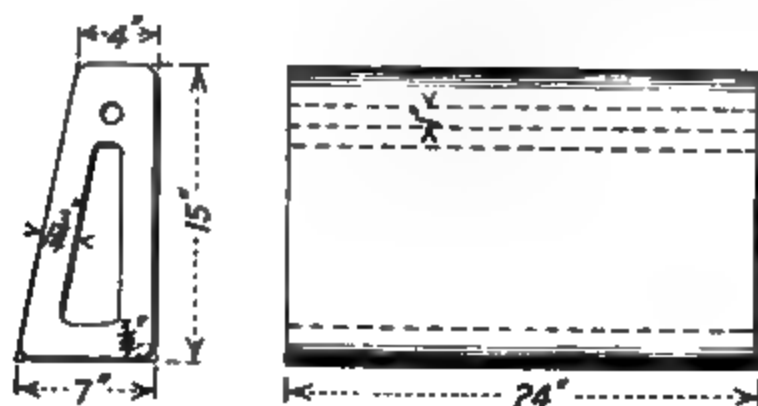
Vitrified Clay Block for Street and Road Curbing.
